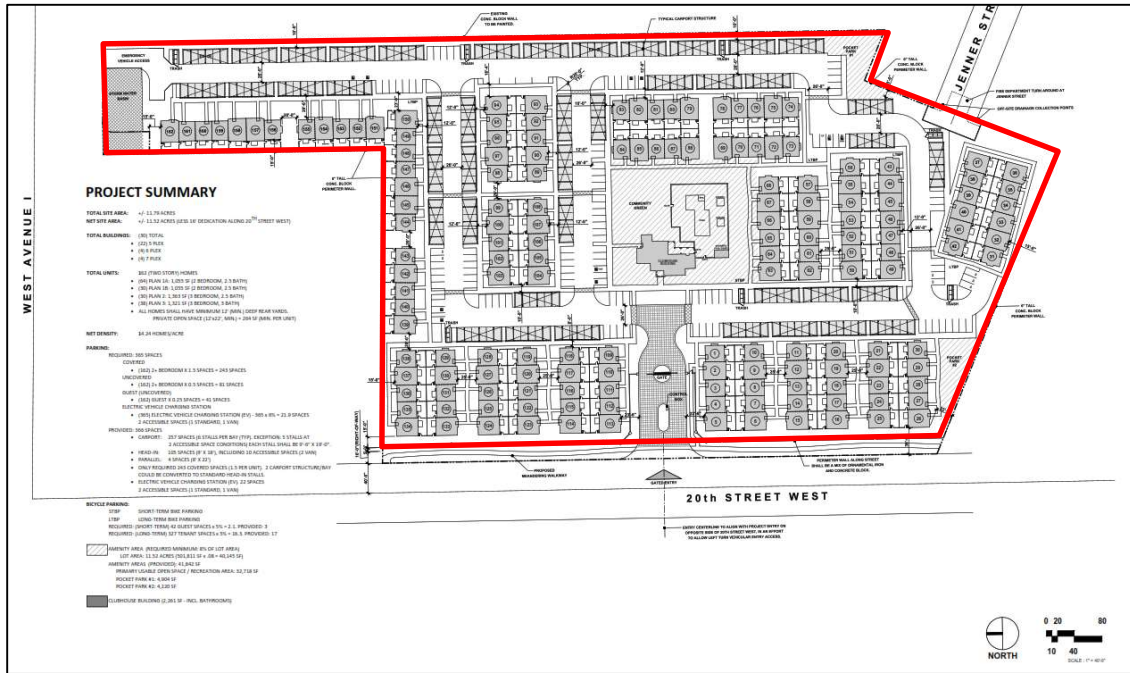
Site Plan – Proposed Apartment Complex - Lancaster, CA
